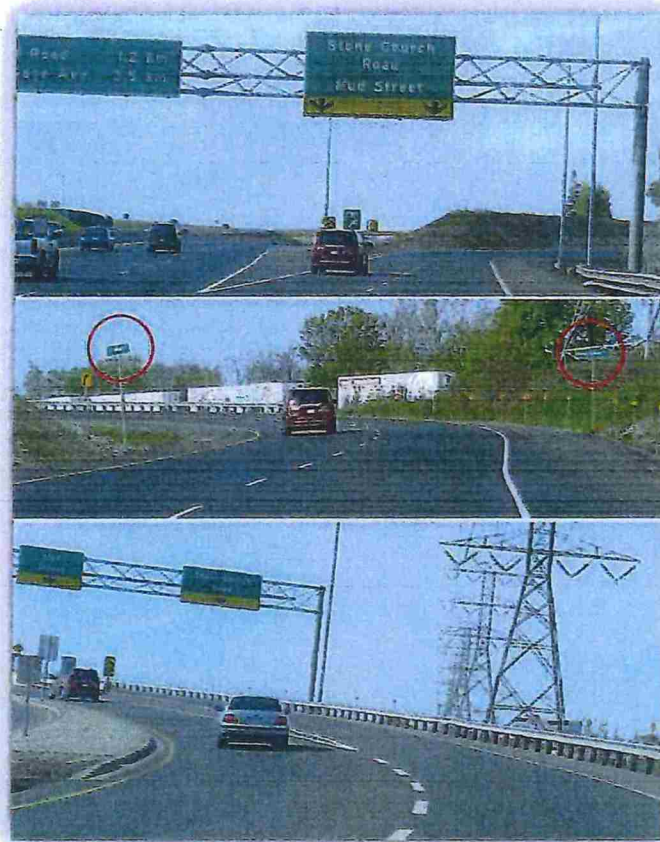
Information Signs Leading to Mud Street and Stone Church Road (View South Successively Traveling South)
